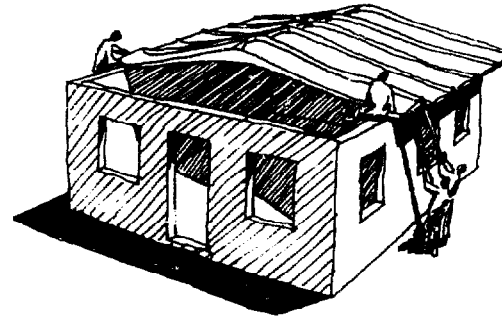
Assembly of Woudenberg Jute-Plastic roof elements on standard brick-walled house (Bangladesh)
